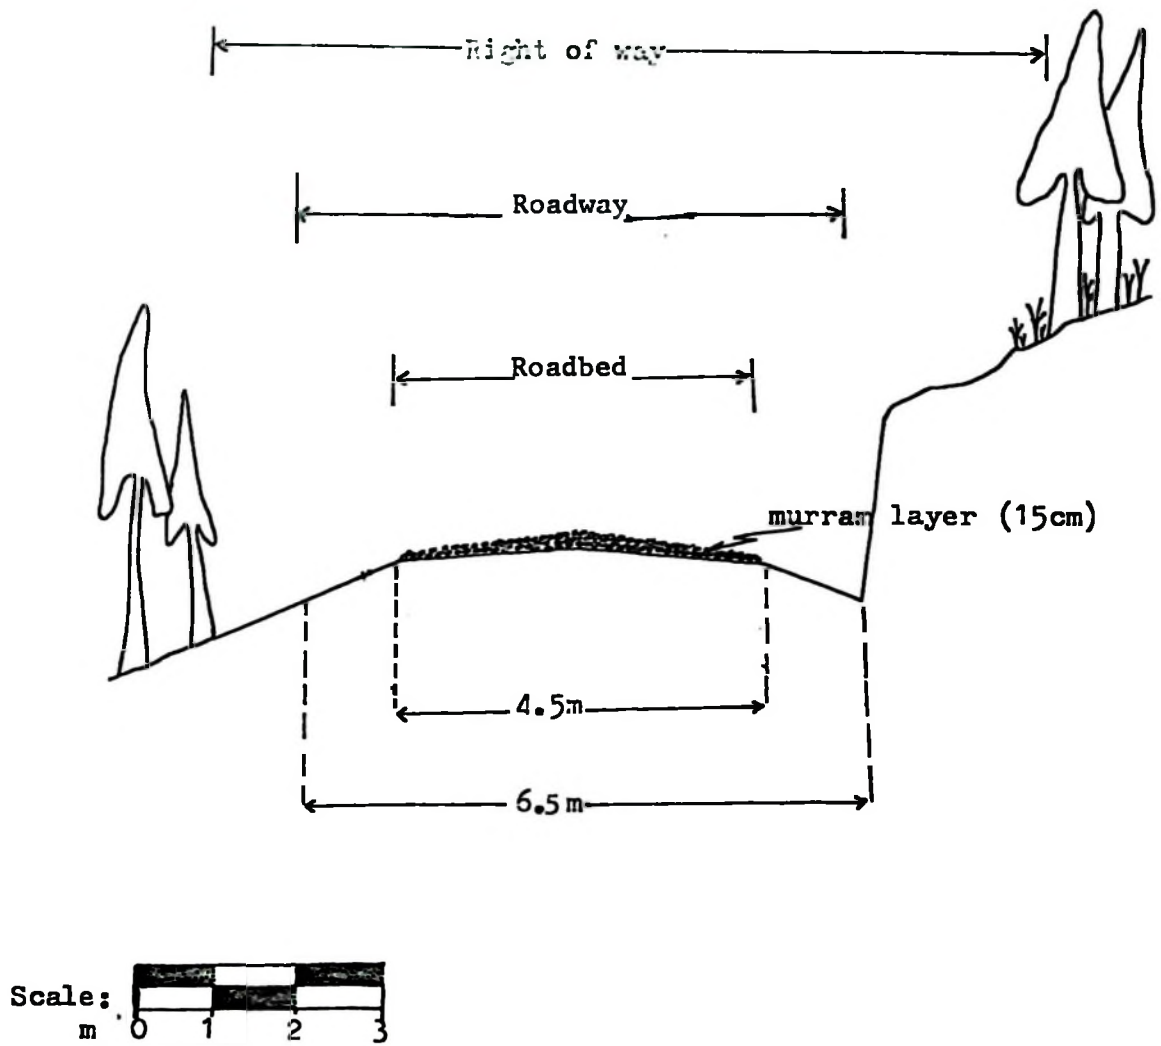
A cross-sectional profile of the existing Laikinoi access road.
